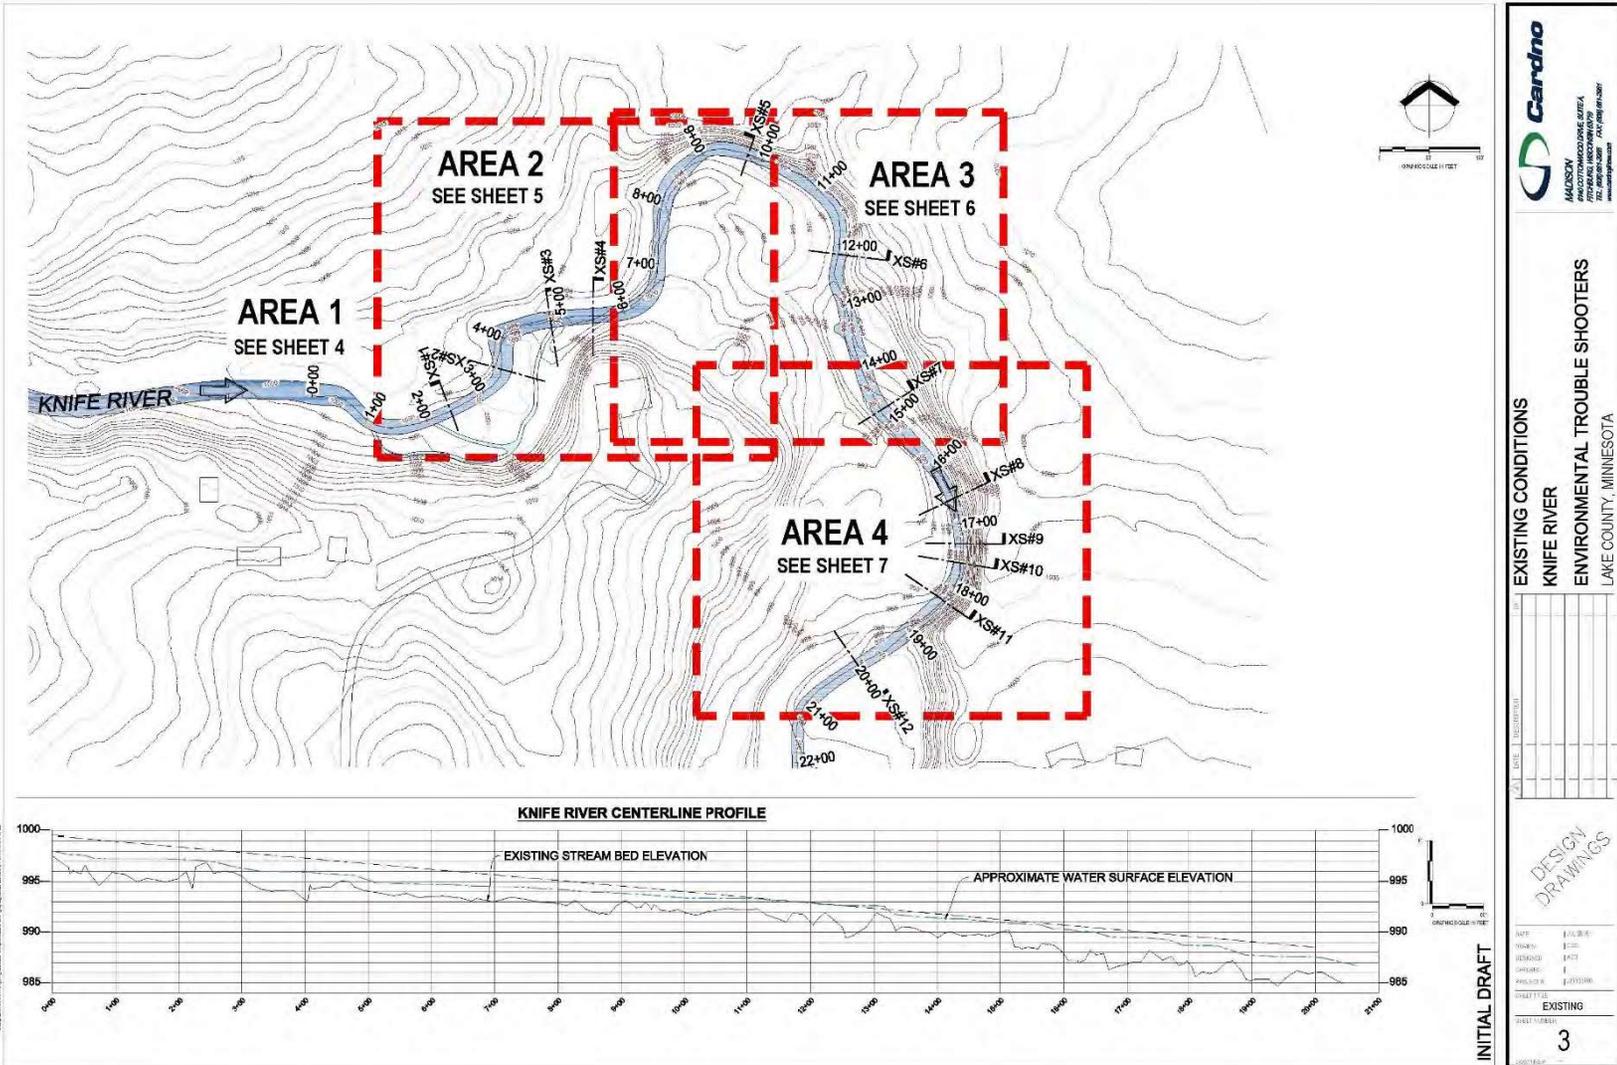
Construction Plan Set: Sheet 3 of 12.
